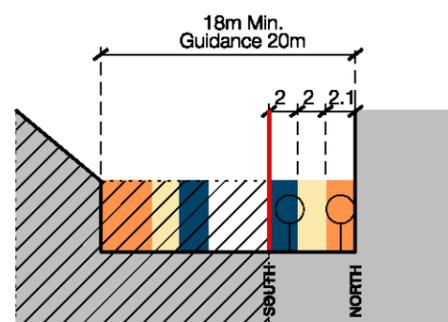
Street coding section: between Plot A and the Parish Rooms.
